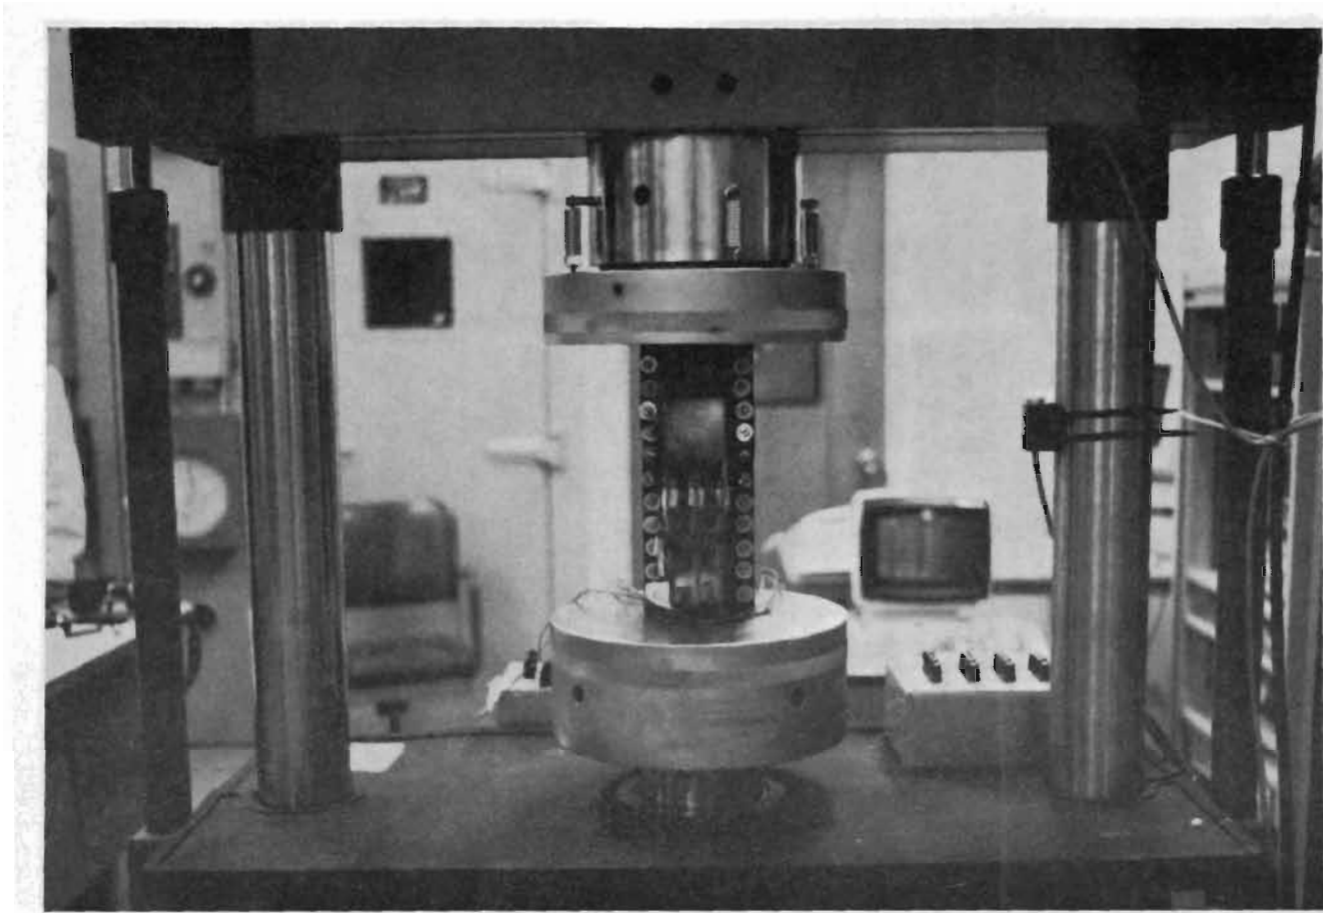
Failure of Stub Columns with Stiffened Flanges (Back View)
